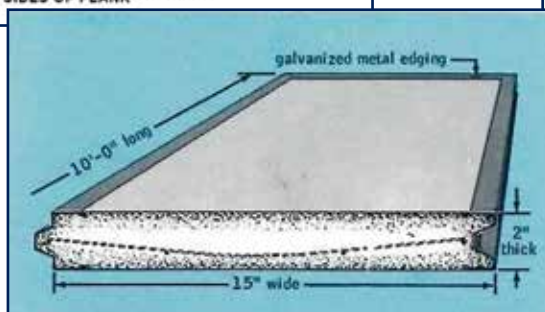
Graphic from vintage U.S. Gypsum literature showing the 2-inch-thick, 10-foot-long plank; it also shows the arrangement of internal wire reinforcing.
